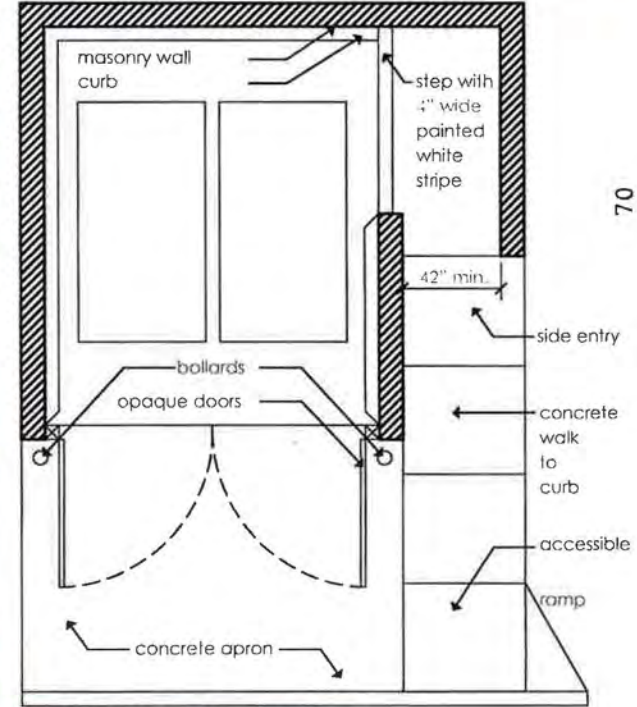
TRASH ENCLOSURE EXAMPLE PLAN
